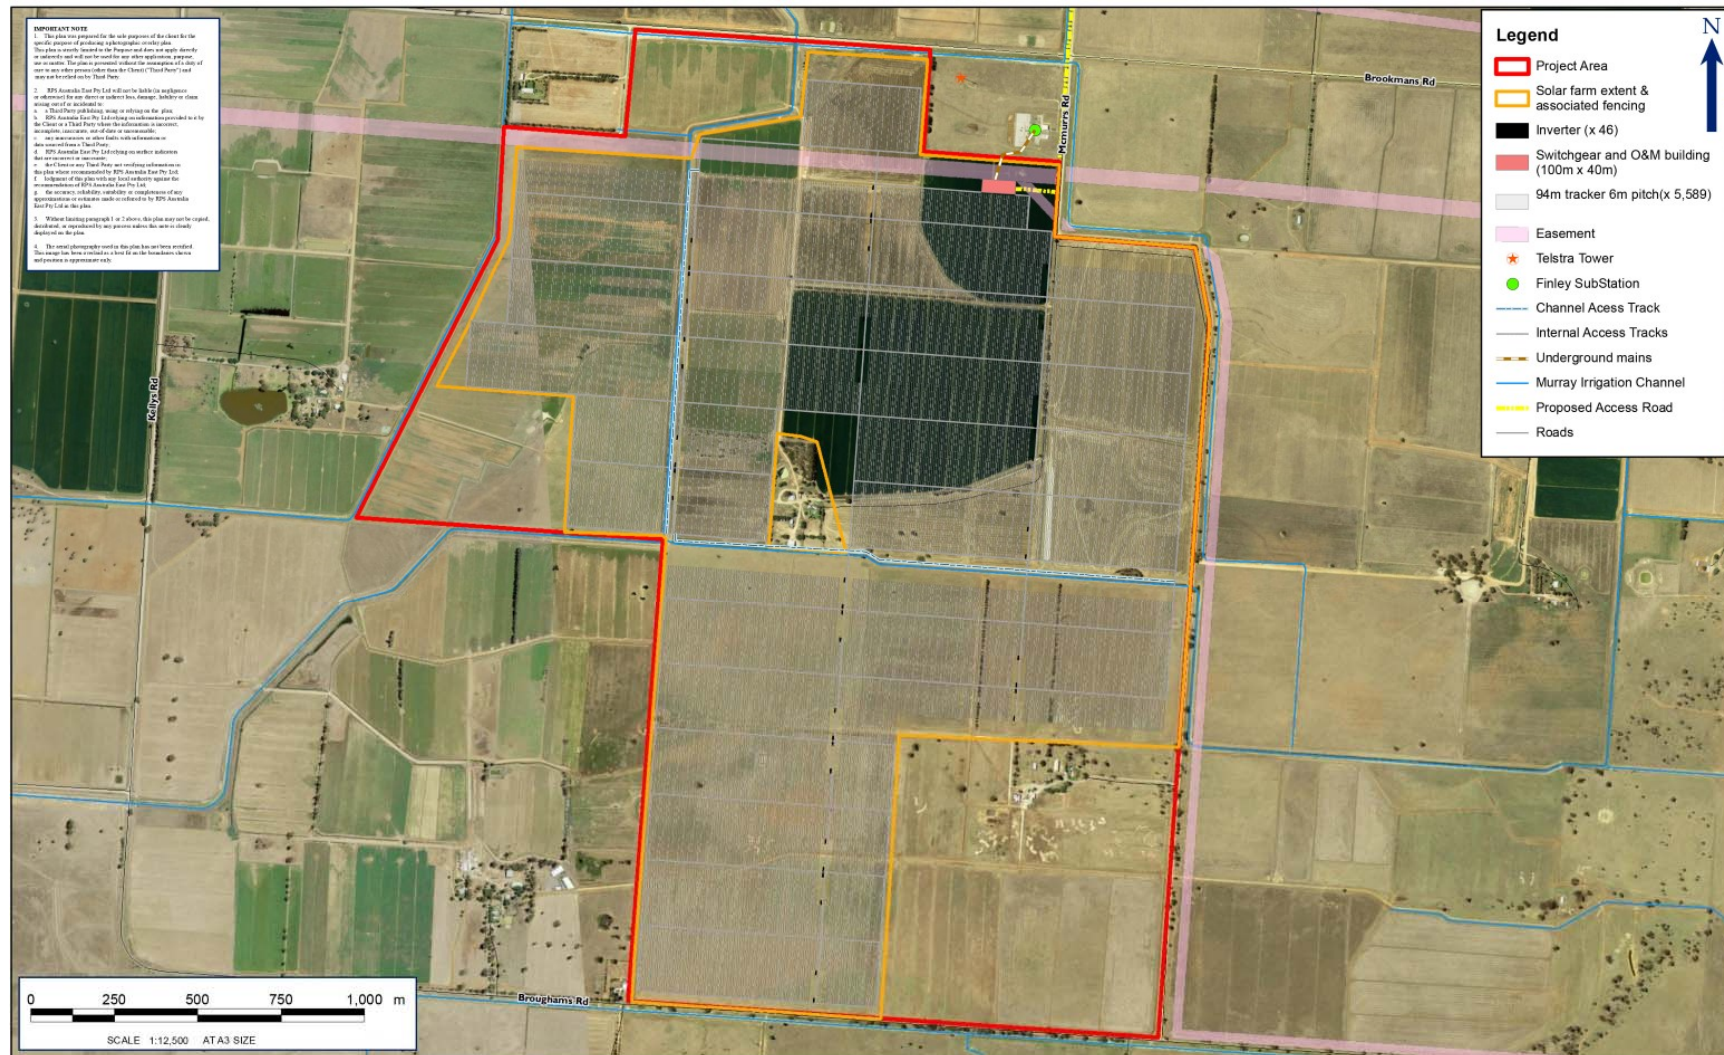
Aerial photo showing subject site and solar farm proposal (from RPS).
